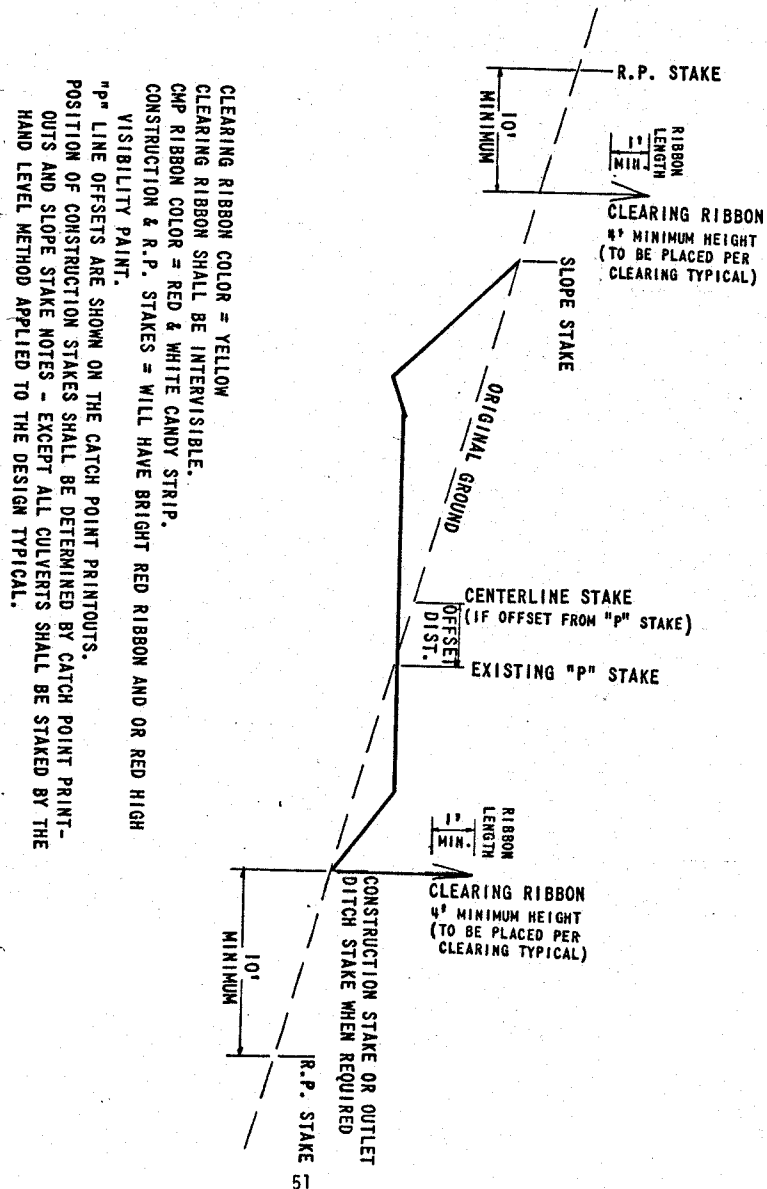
EXHIBIT C STANDARD CONSTRUCTION STAKE MARKING
